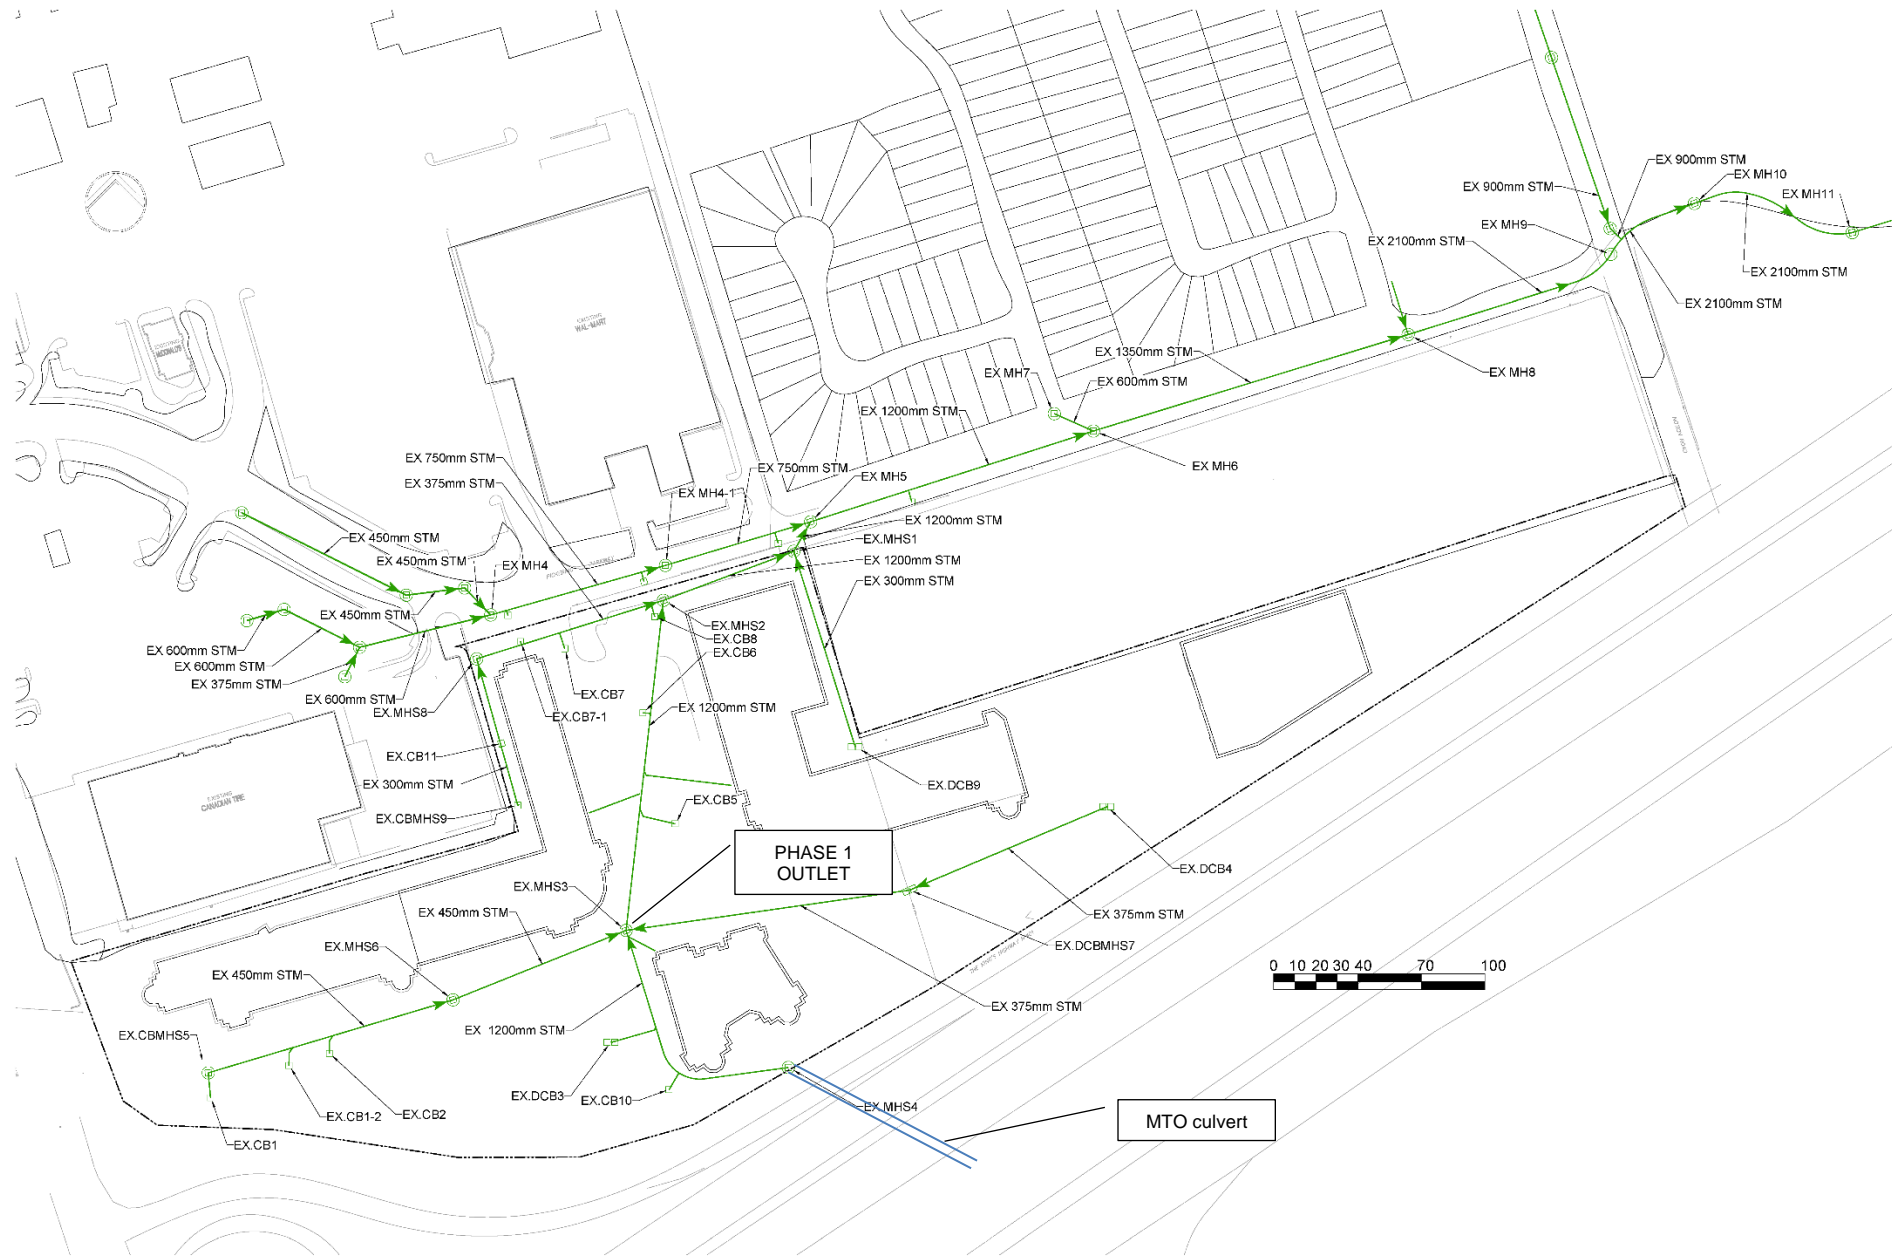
City layout of existing Storm sewers and Site sewers
